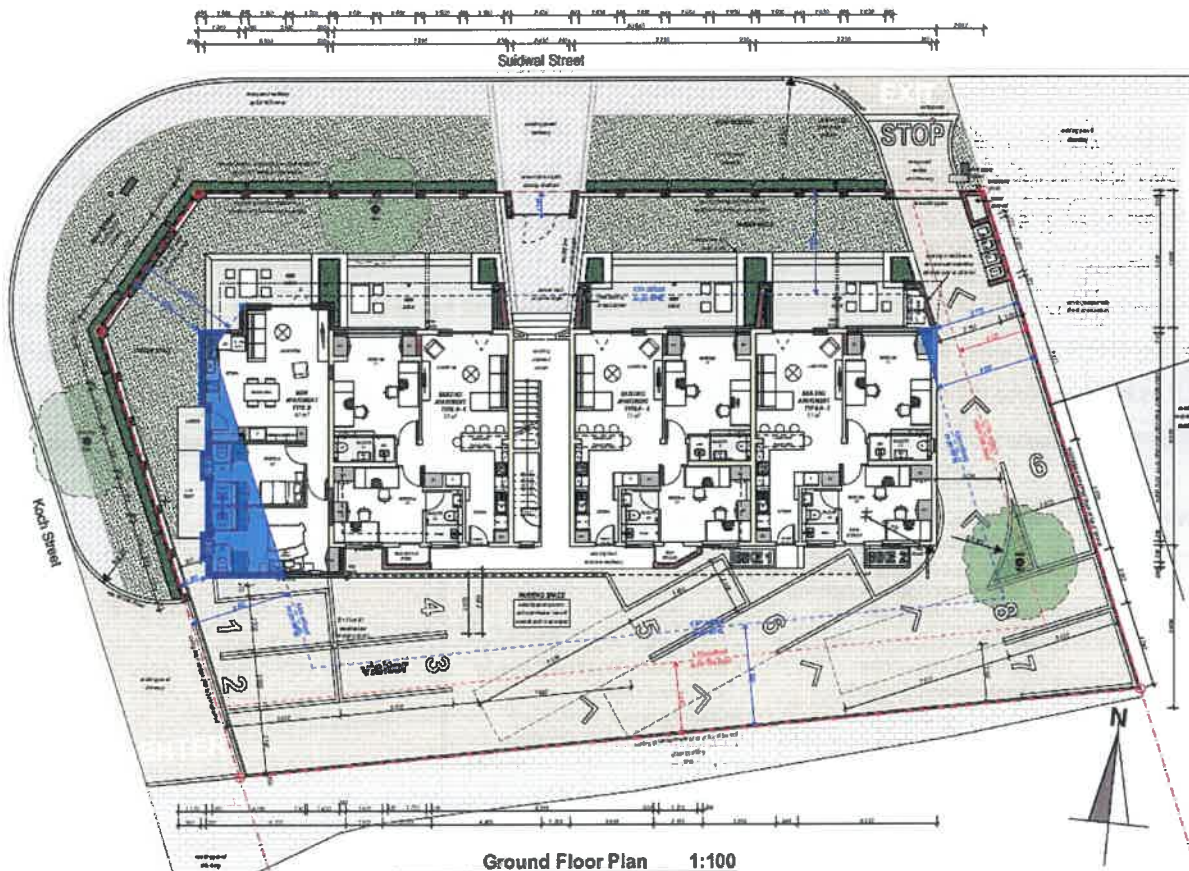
Ground Floor plan of proposed new extension on existing flat block
